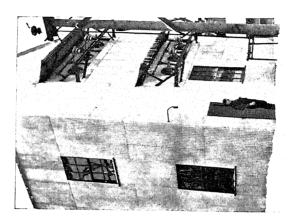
BUNKER HILL AND SULLIVAN SUBSTATION, LOOKING EAST
